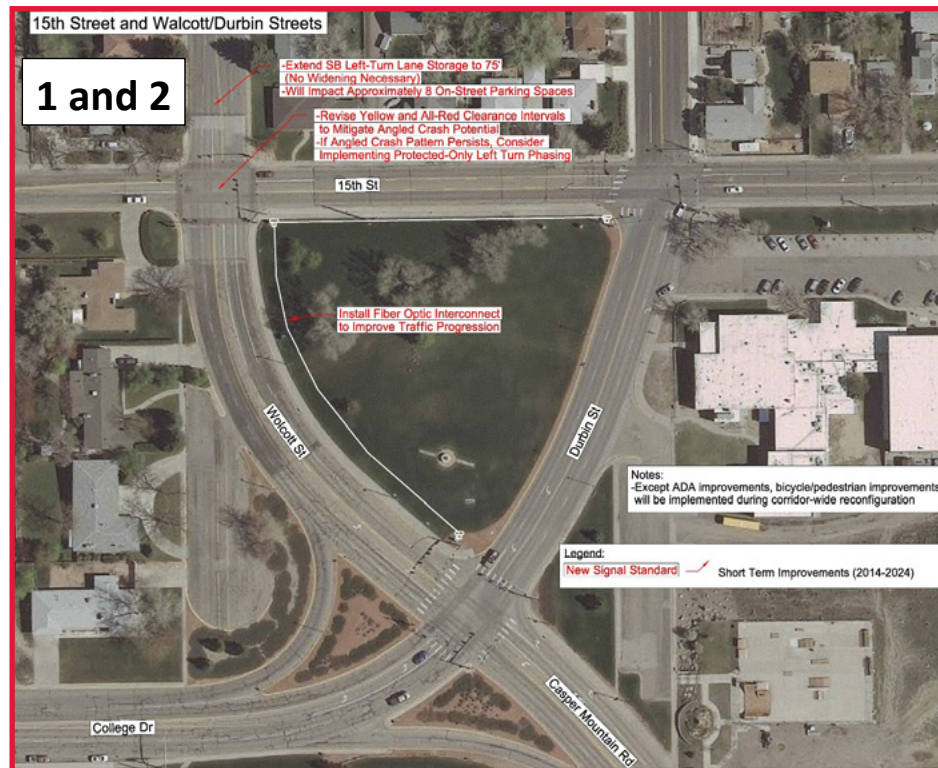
Spot Improvement Plan (Page 2 of 2)
